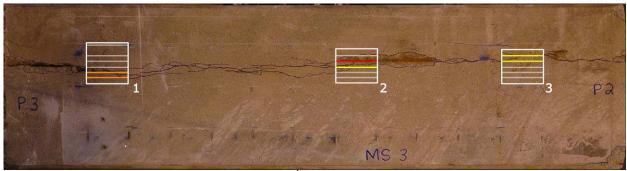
Location of 2<sup>nd</sup> Layer Punch outs on Beam MS3
